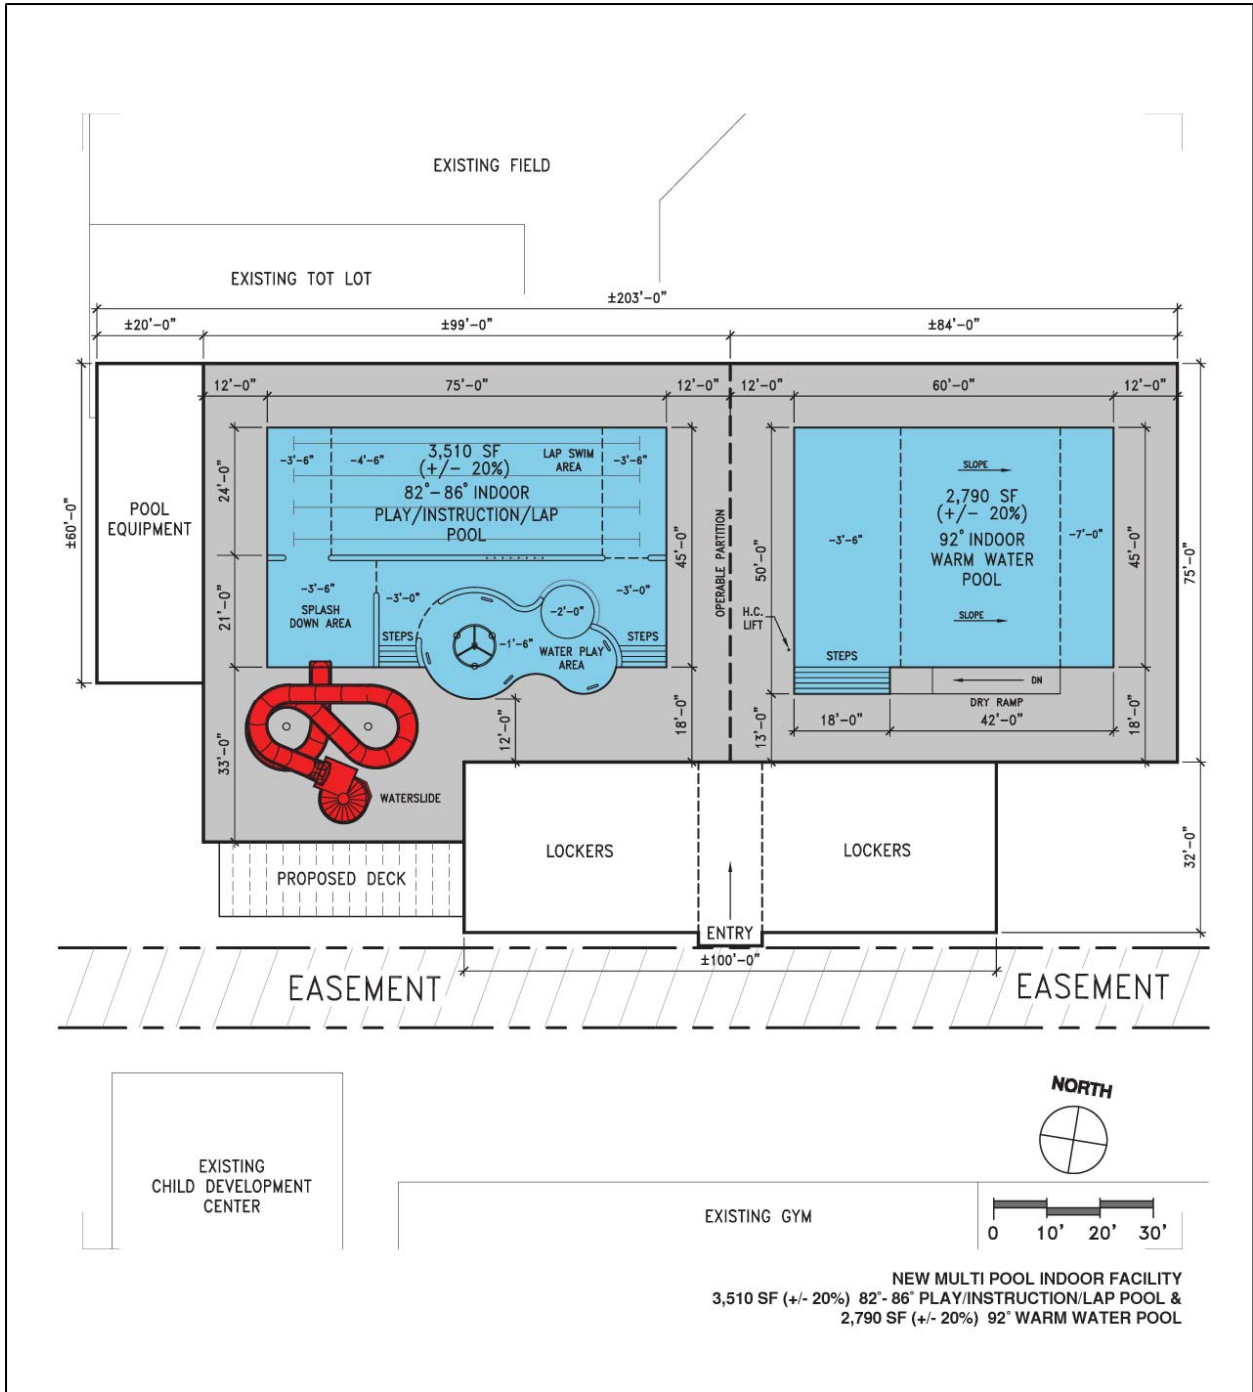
WEST CAMPUS: FACILITY PLAN
